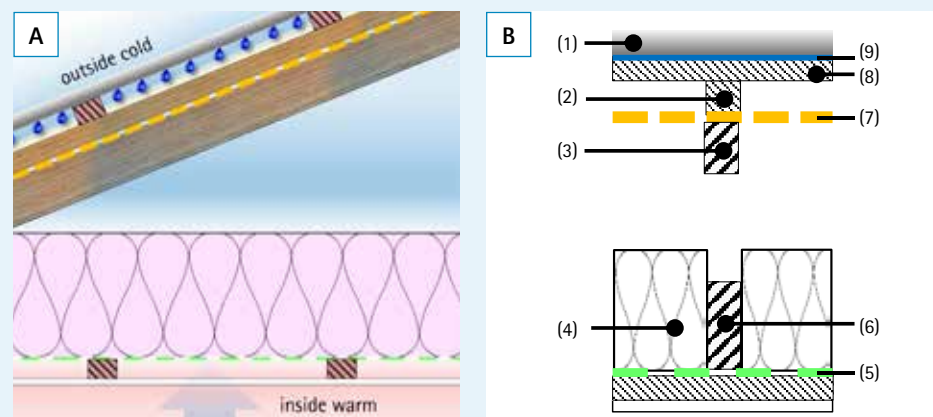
A: Above Sheathing (membrane) Ventilation has several benefits: The cold outdoor air is not actually cold relative to the supercooled cladding, it is warm. The ventilation air acts to warm the cladding and membrane surface reducing the risk of moisture damage and improving energy efficiency by reducing energy losses. An Intelligent Air Barrier (IAB) at the ceiling line prevents moist air going up into the roof space through any superhighways created by ceiling penetrations. B: (1) Metal sheet roof, (2) Counter batten, (3) Truss top chord, (4) Bulk insulation, (5) INTELLLO® PLUS, (6) Truss, (7) SOLITEX MENTO®, (8) Fixing batten, (9) condensing plane
